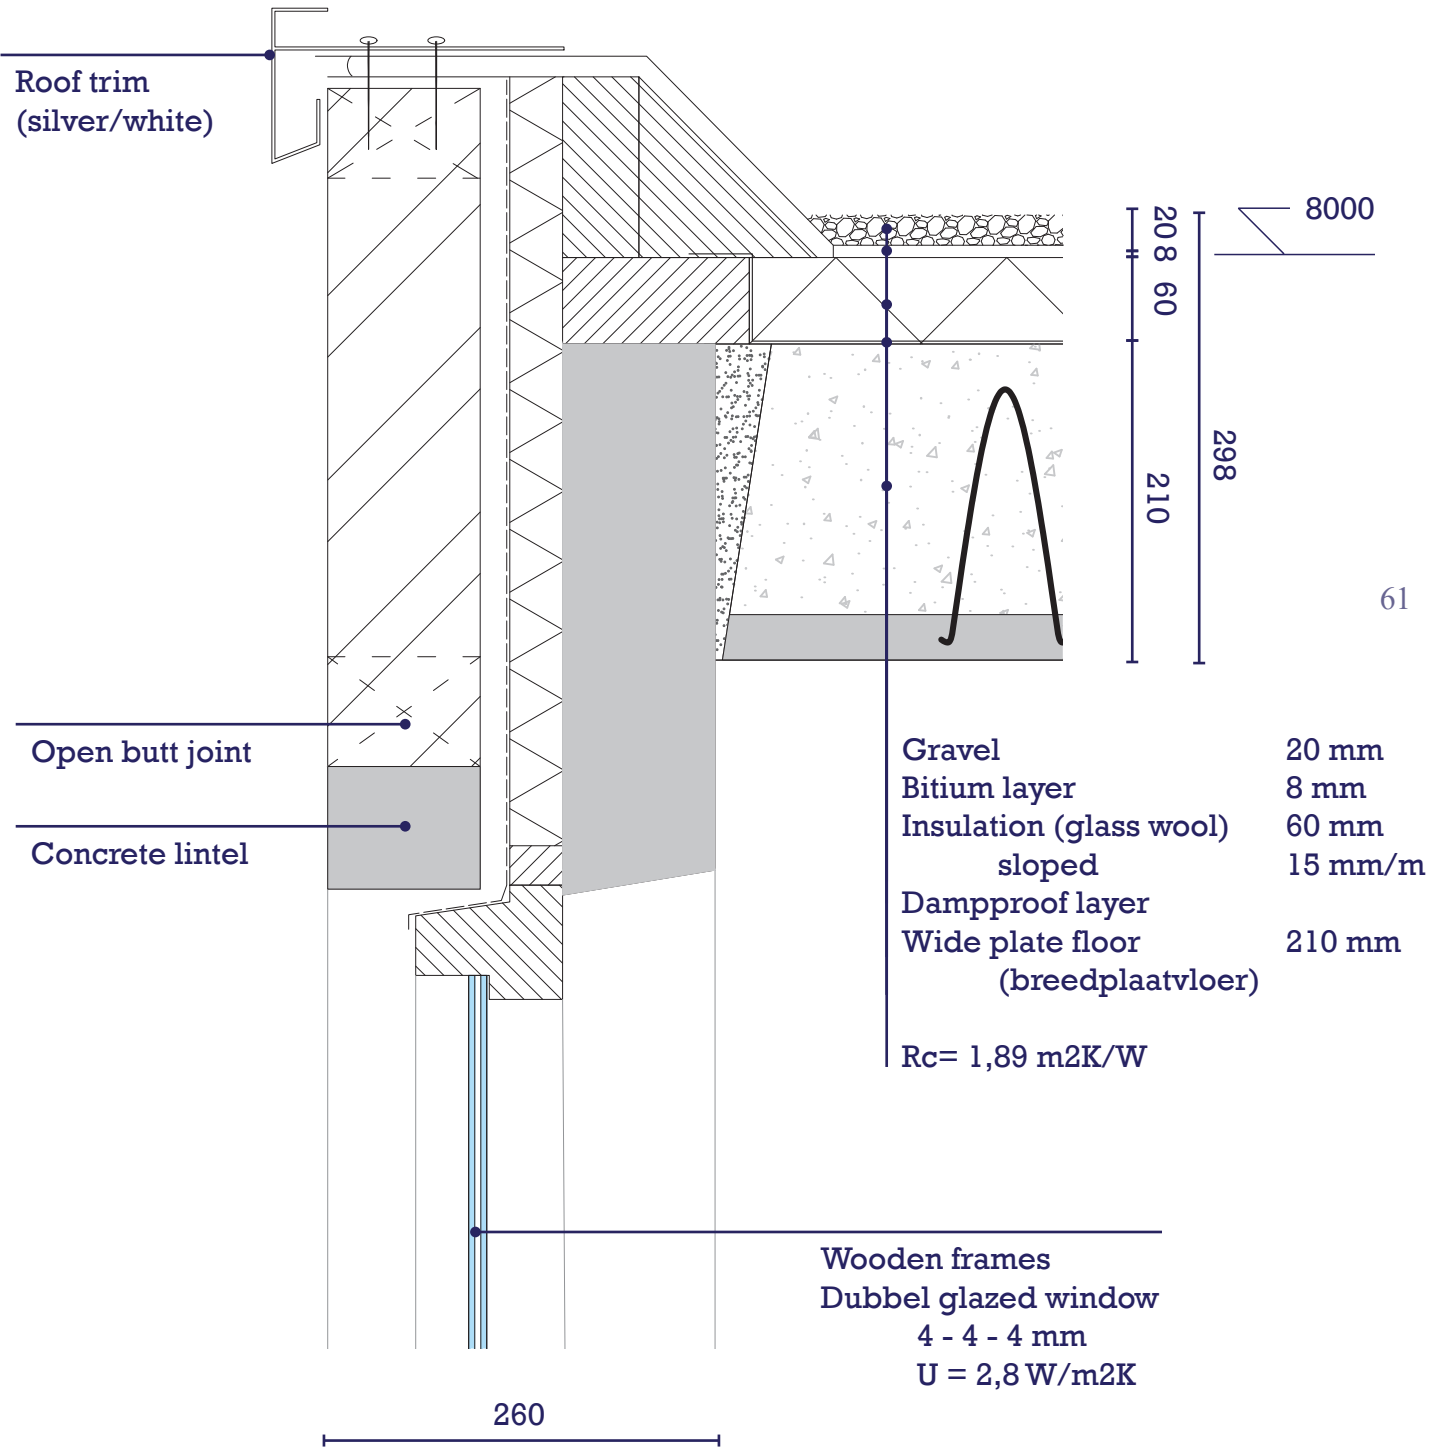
OVERHANG AND FIRST FLOOR (1:5)
